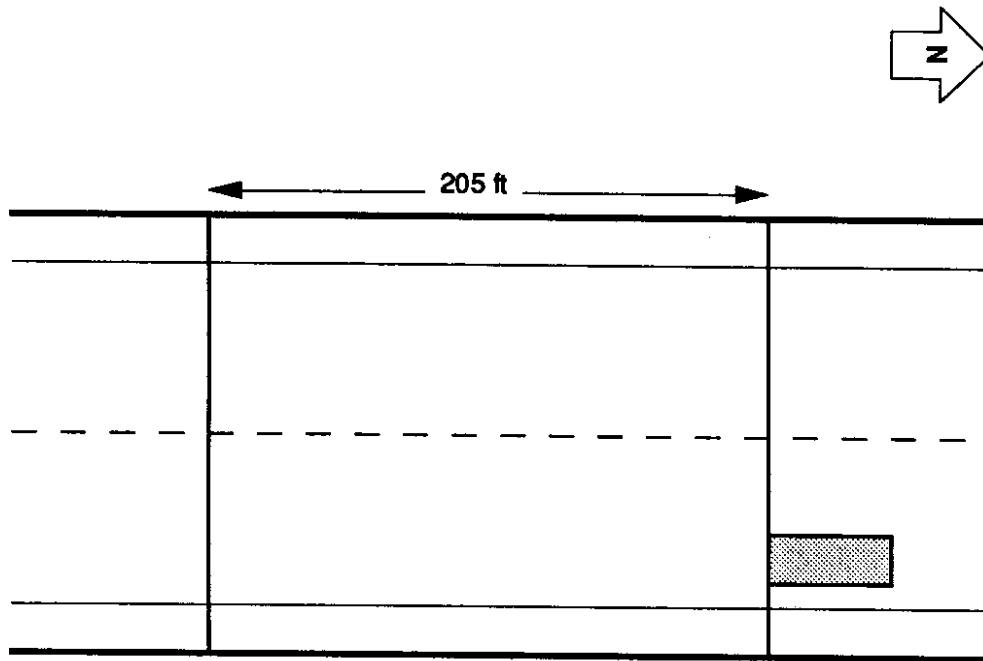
Location of Test Section in Northbound Lane of the Kettle River Bridge (M.P. 156)
